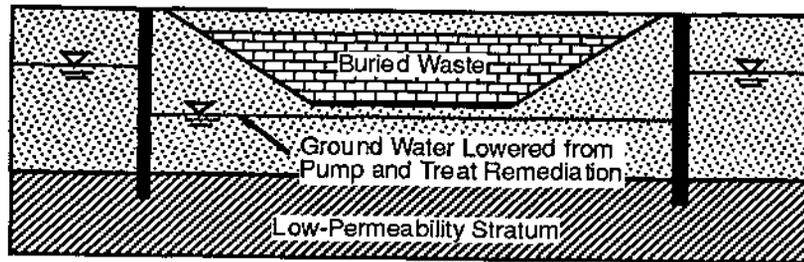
Example of Vertical Cutoff Wall to Restrict Inward Migration of Ground Water.
